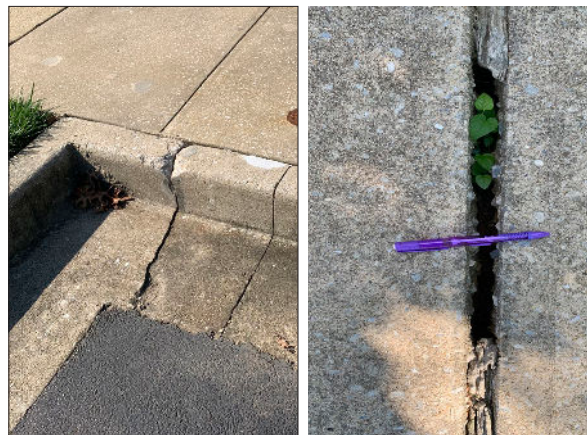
Example of curb and sidewalk repairs as noted in our report near building 2218 and 2215.
